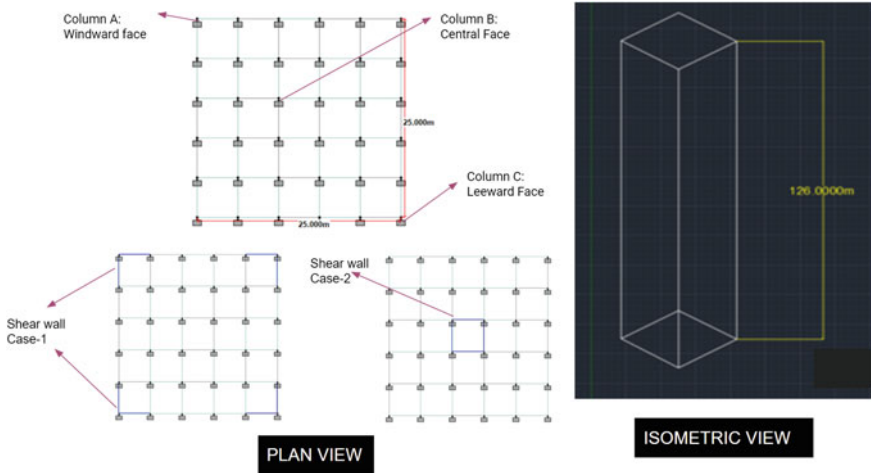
Plan view of building, shear wall case-1, shear wall case-2, and isometric view of square-shaped building
